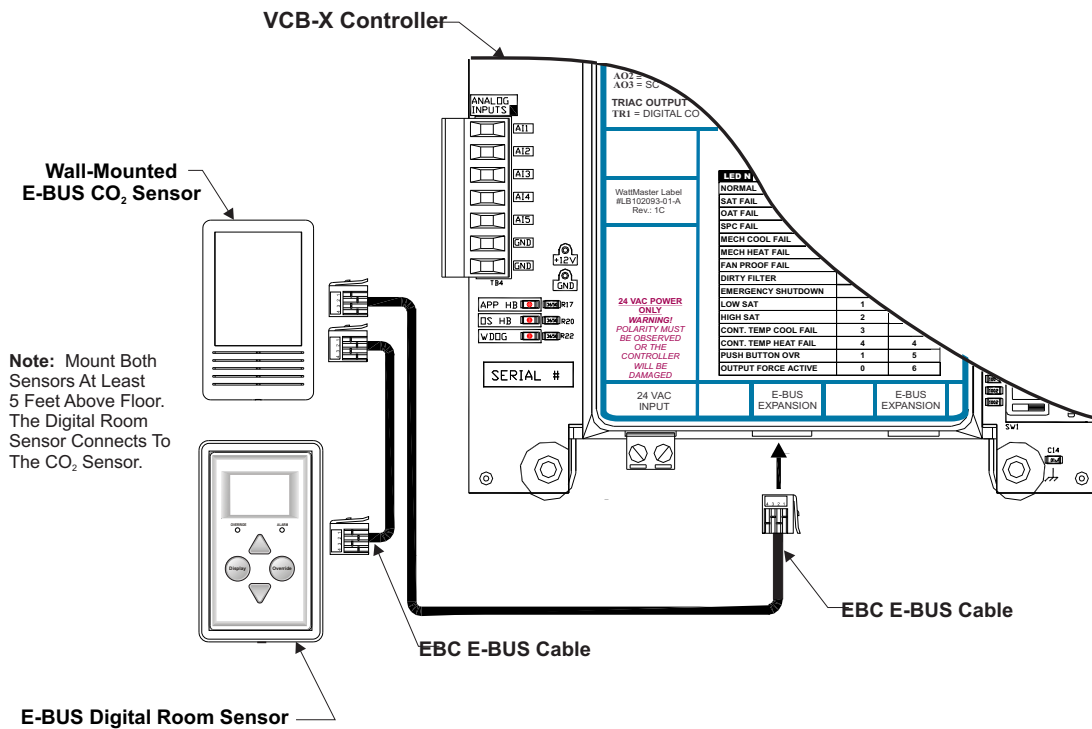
OE256-05 – Wall Mounted E-BUS CO₂ Sensor Wiring
